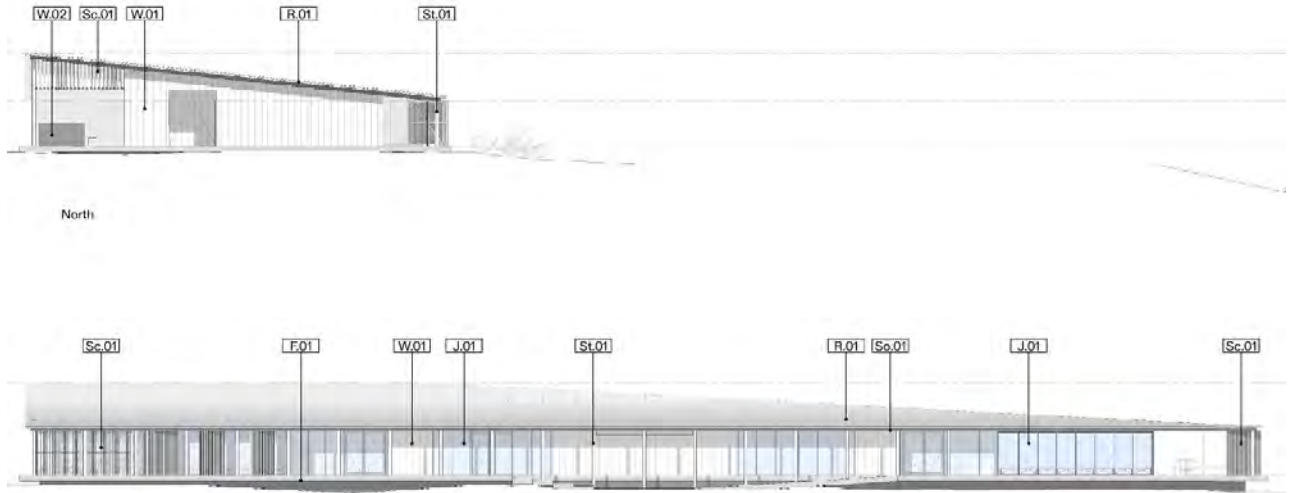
Elevation Drawings and Visualisation of the Sports Academy Building Showing Form and Materiality
